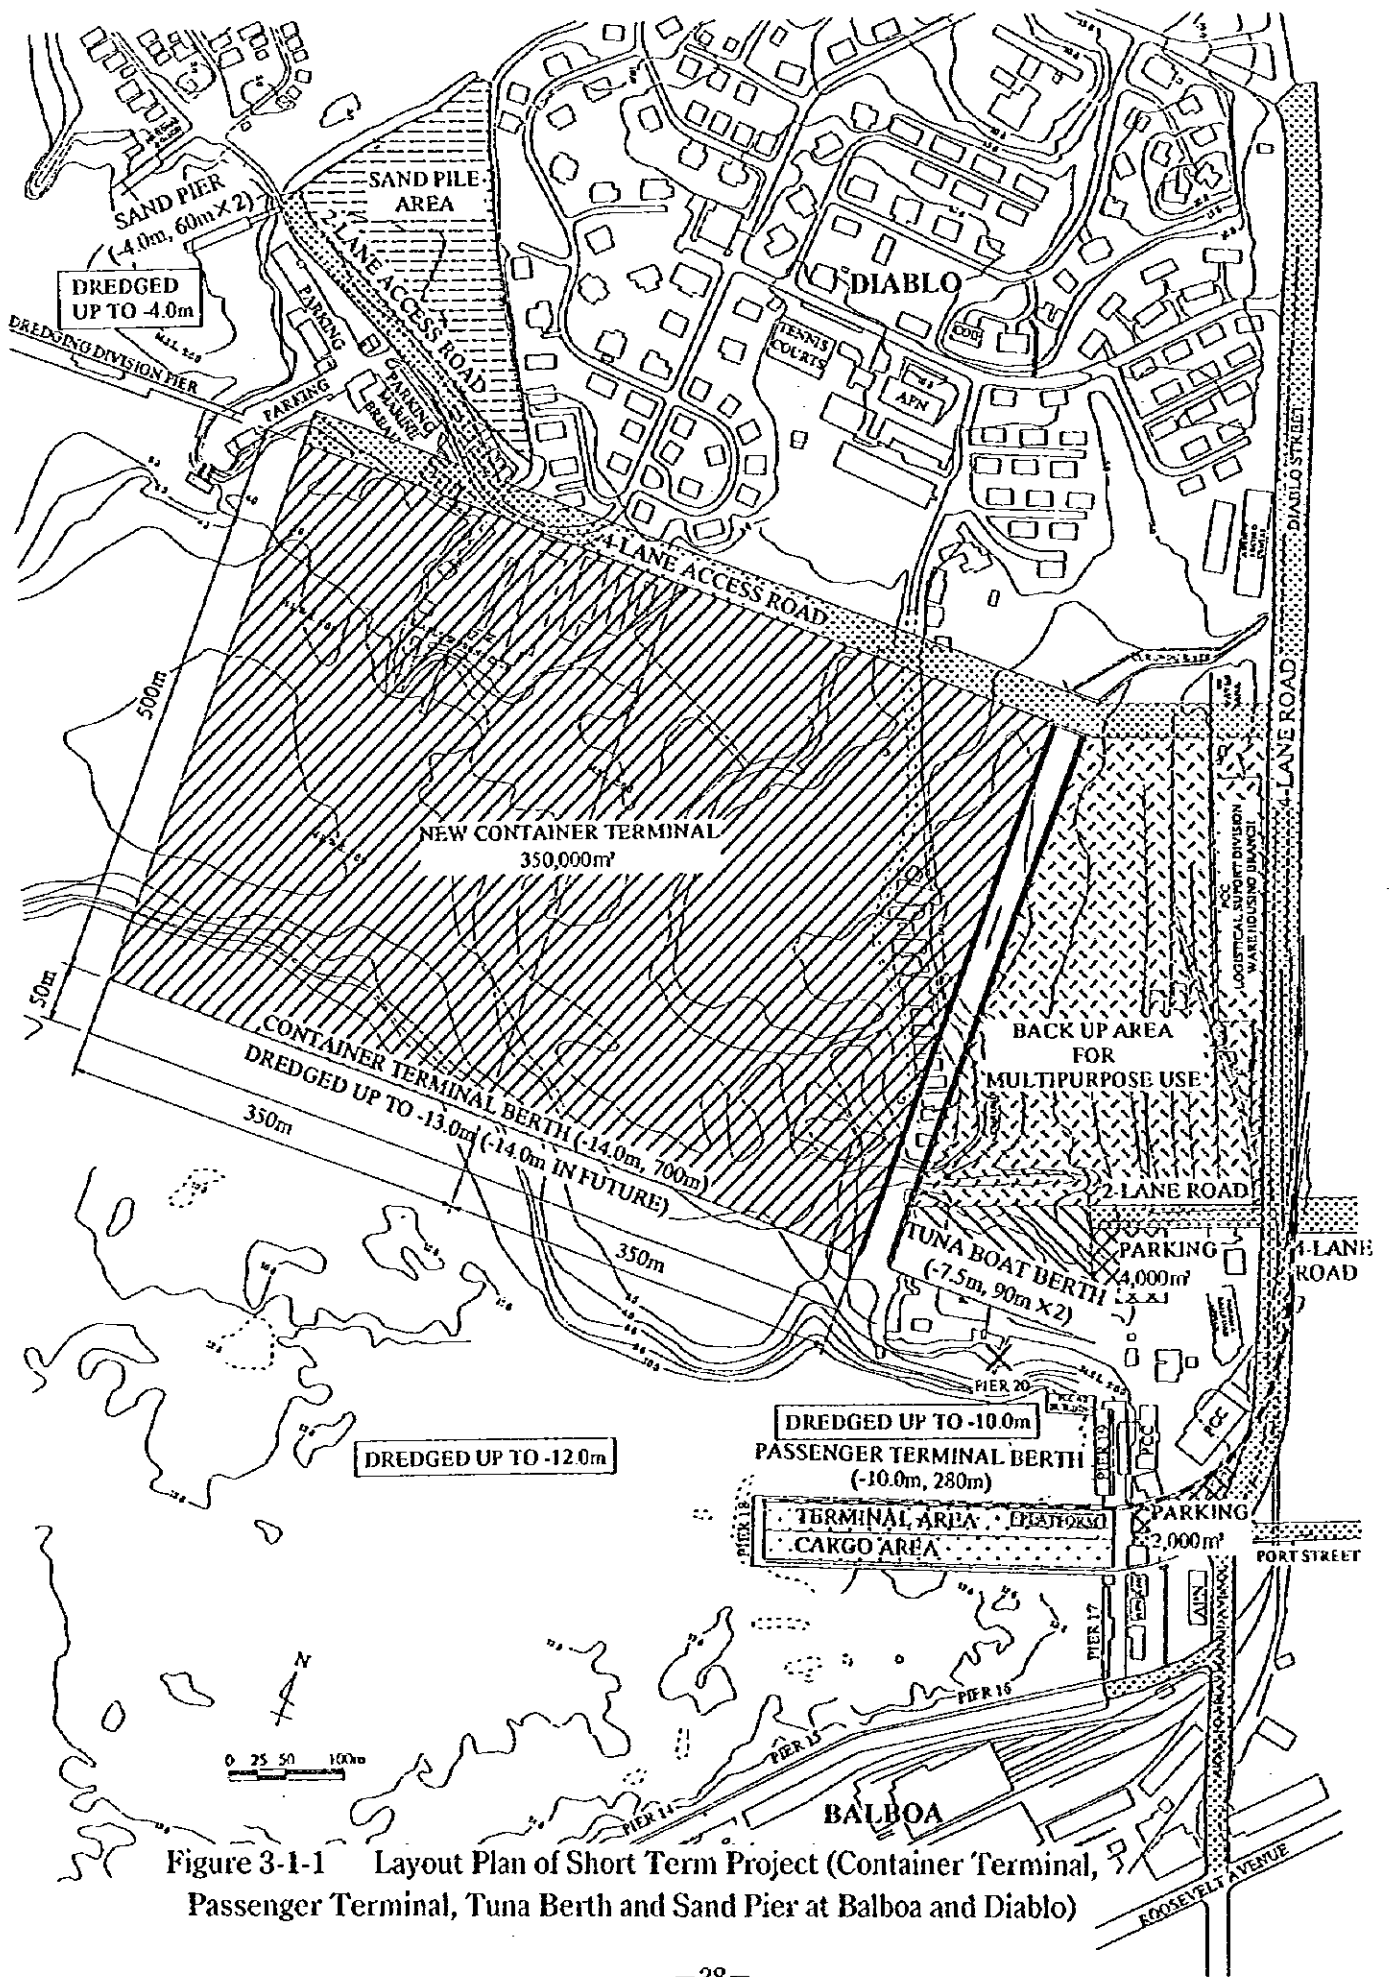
Layout Plan of Short Term Project (Container Terminal, Passenger Terminal, Tuna Berth and Sand Pier at Balboa and Diablo)
